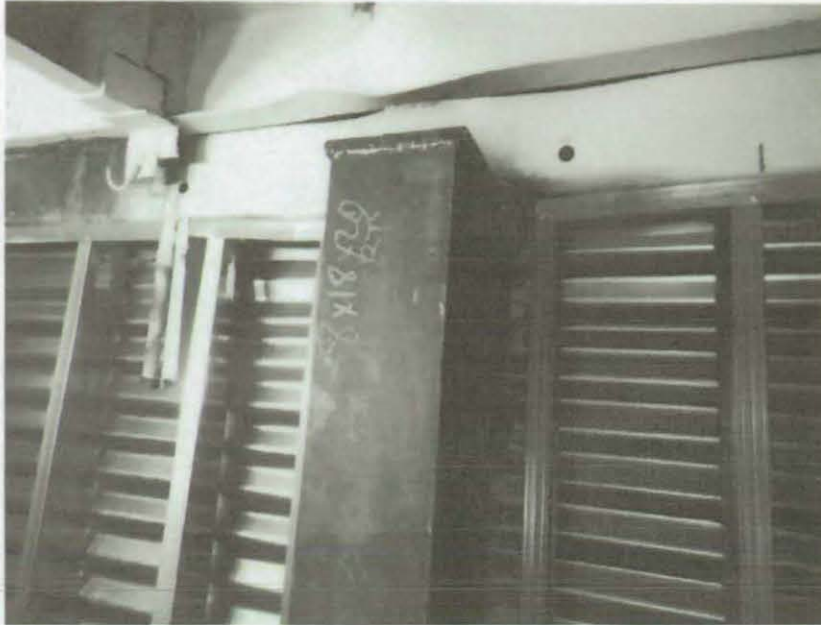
Top of west column. Note buckled flange of beam beyond.
